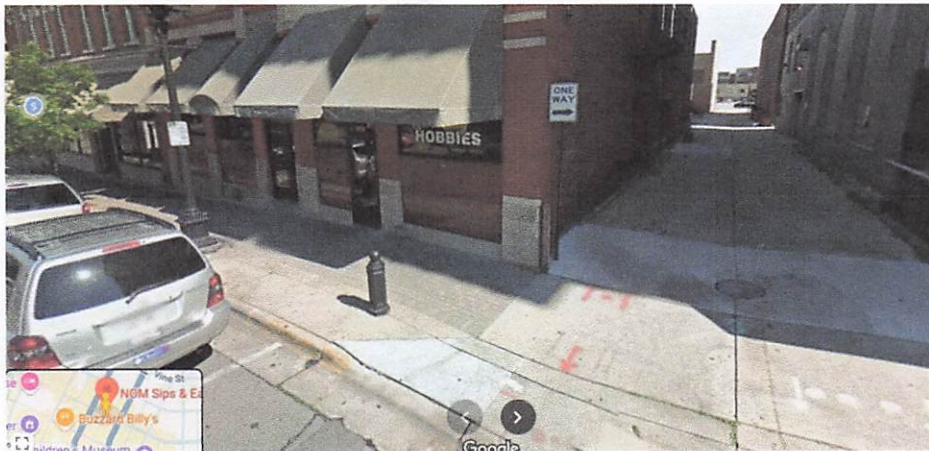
Current Sidewalk, Parking, and Alleyway 313 Main St.
